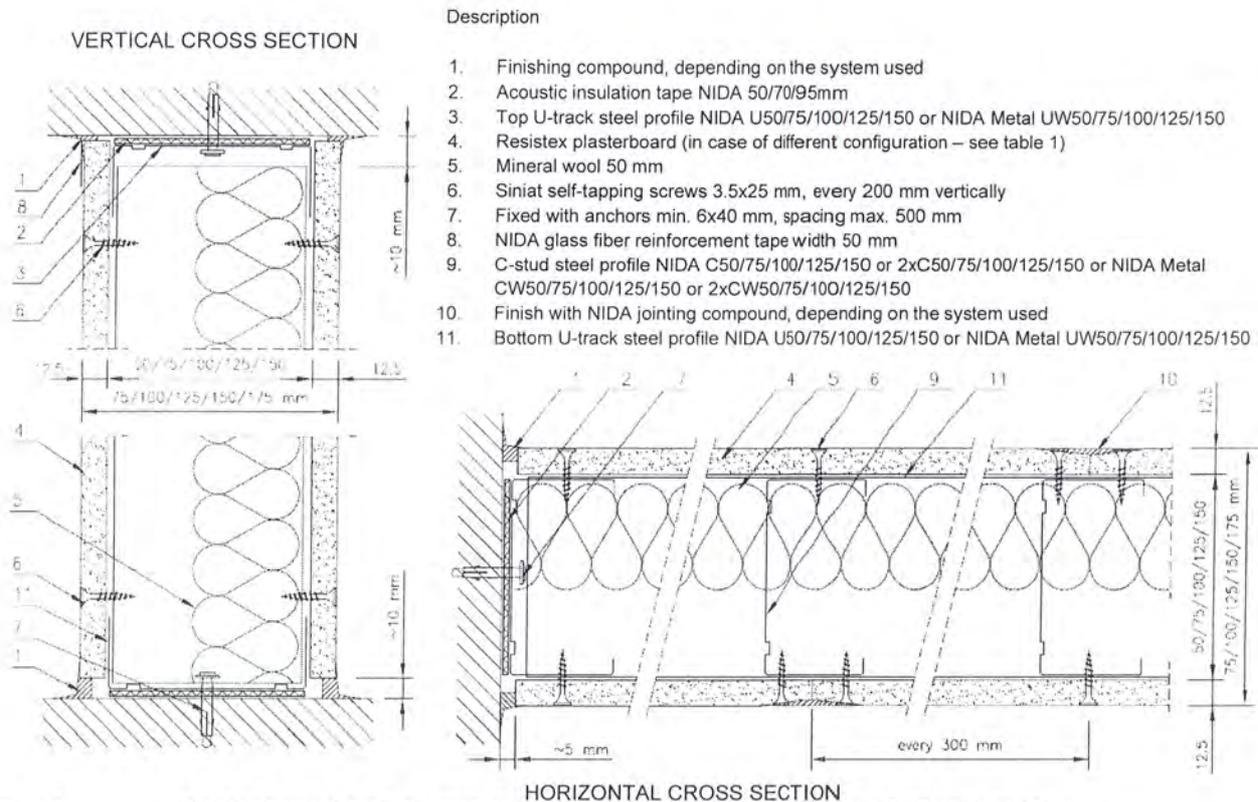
Vertical and horizontal cross-section of anti-burglar non-loadbearing partition wall with a single framework and single layer of board.
